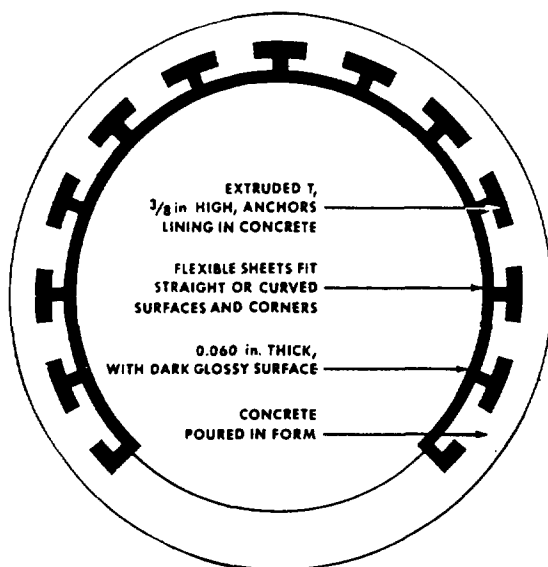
Cross section, exaggerated, of plastic liner for concrete pipe.
